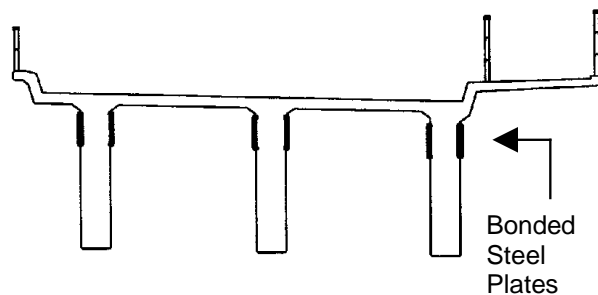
Typical Cross Section of the Strengthened Bridge Deck.
